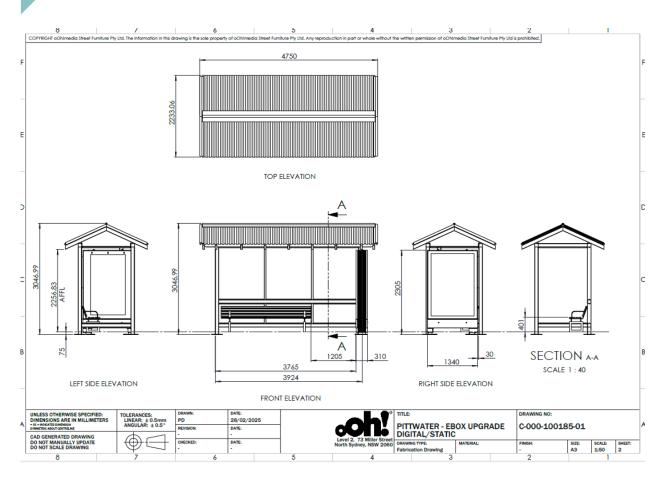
Proposed Digital/Static Signage Elevation – Pittwater
